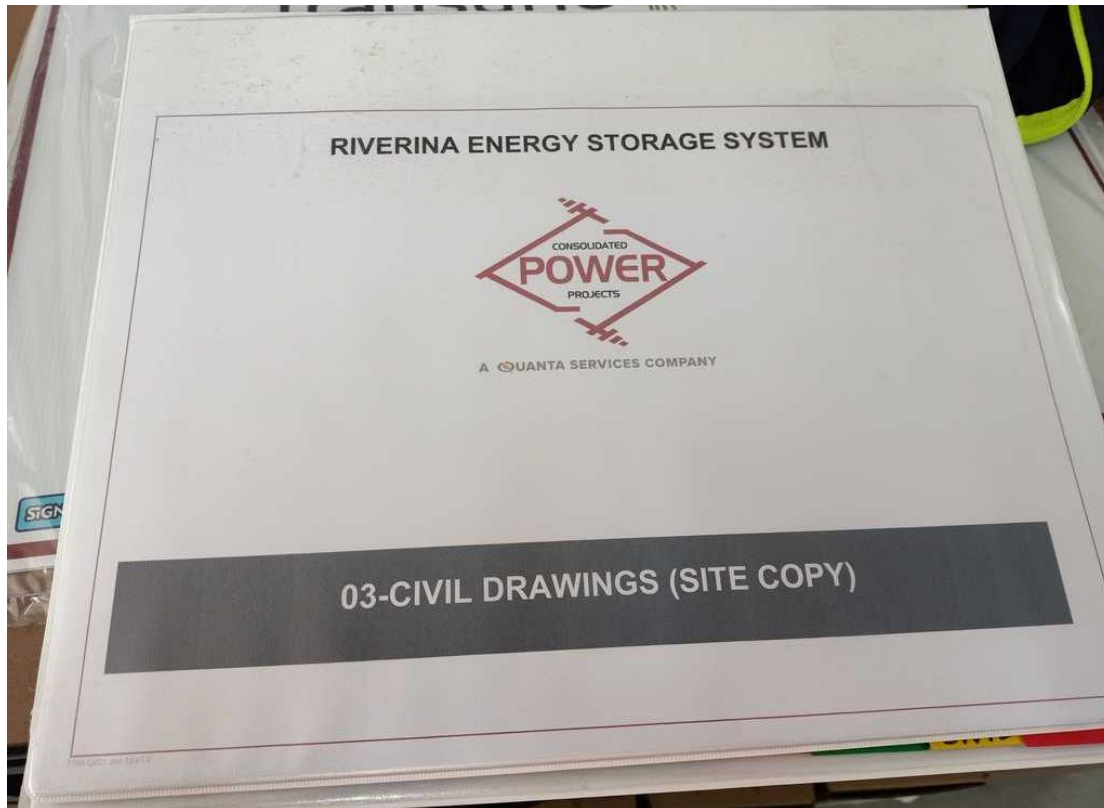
Approved Final Layout Plans (Civil Drawings) issued for construction kept in site folder
